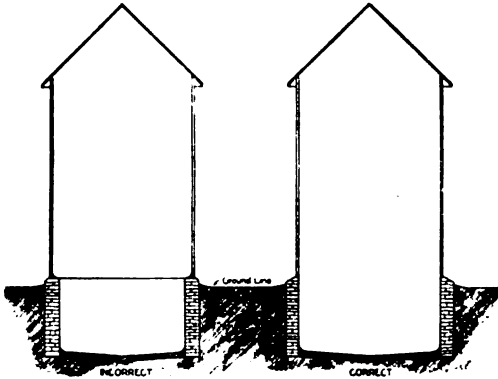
Correct and Incorrect Methods of Constructing Silo Foundations
